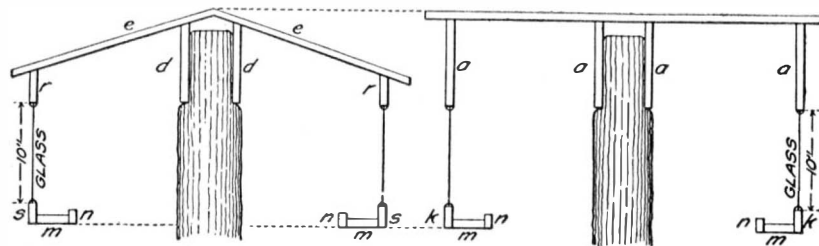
Cross and longitudinal section of food house shown in Fig. 5.
